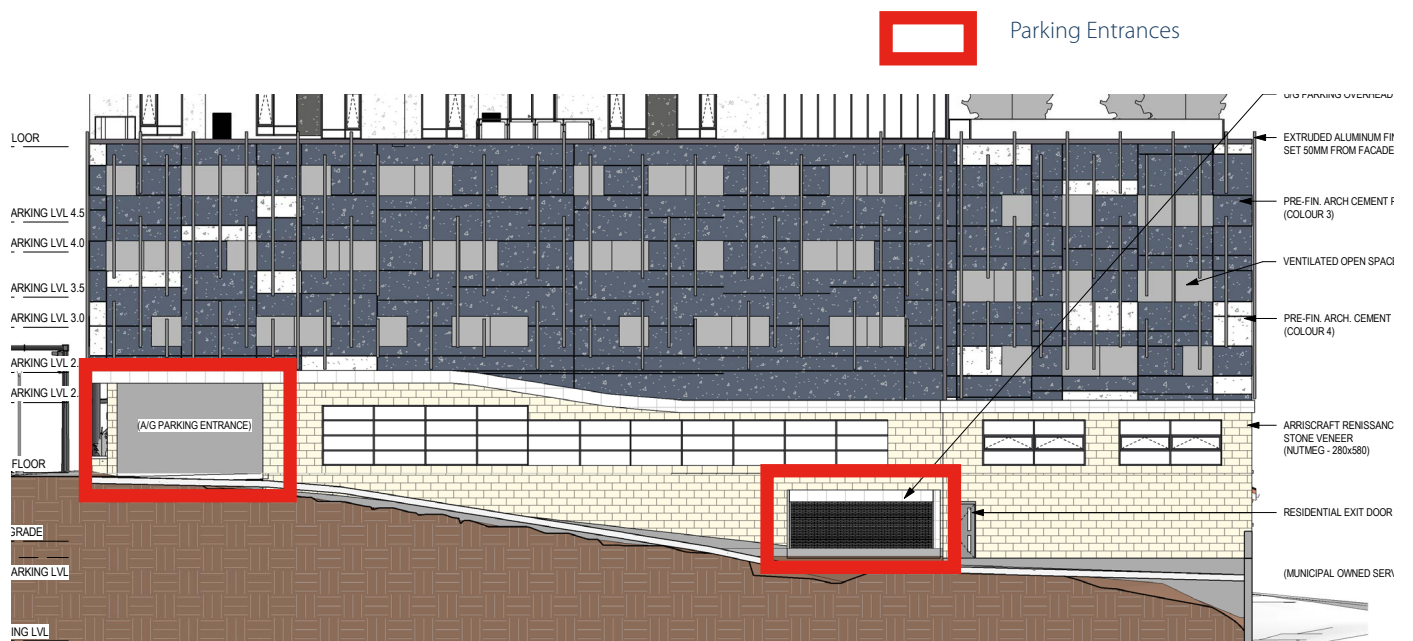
West facade elevation showing parking entrances screened from the public realm.
